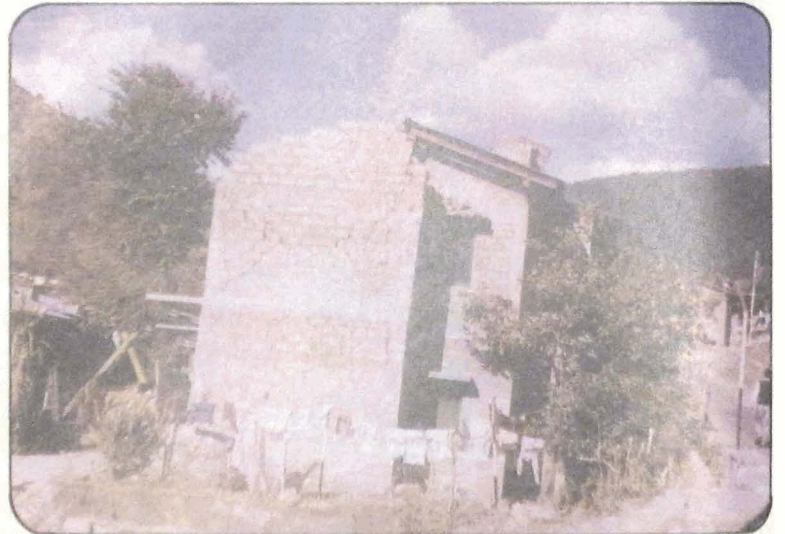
Shear cracks and partial collapse of the first floor of a house in Tileth colony, Uttarkashi.
